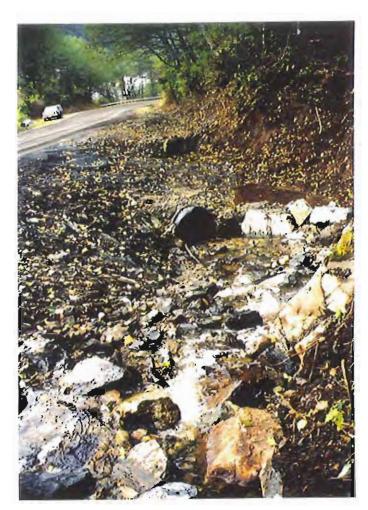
10/20/99 view of the two 3'-dia culverts now providing positive surface water drainage from along the upland side of Sawmill Creek Road. The new culvert in the foreground is about 4' lower than the old culvert.
